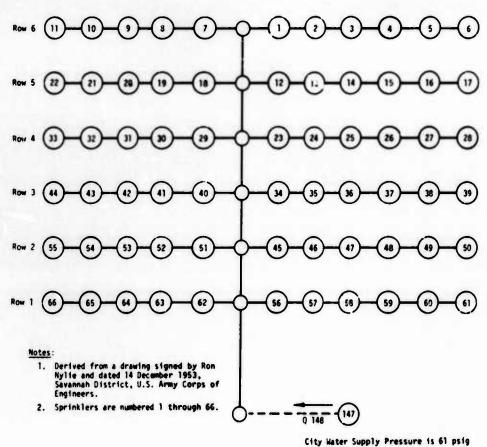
Sprinkler System in Mezzanine of Building 786 at McClellan Air Force Base
